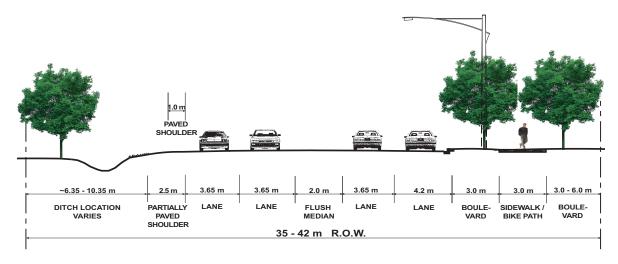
Arterial Road (Tremaine Road (RR 22)) illustrating semi-urban road section adjacent to the Escarpment lands.
